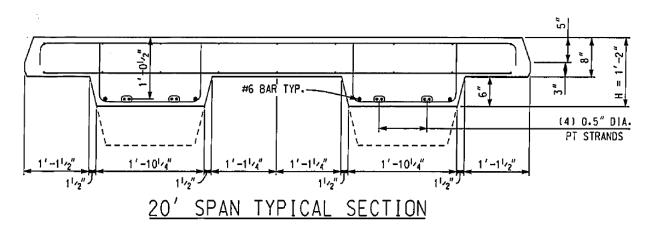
Example of Con-Struct Bridge Cross-Section [54]
